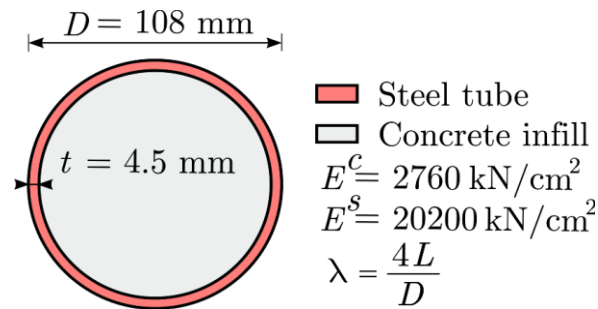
Material properties and cross section of CFST columns by Simon Schnabl and Igor Planinc 2017.
